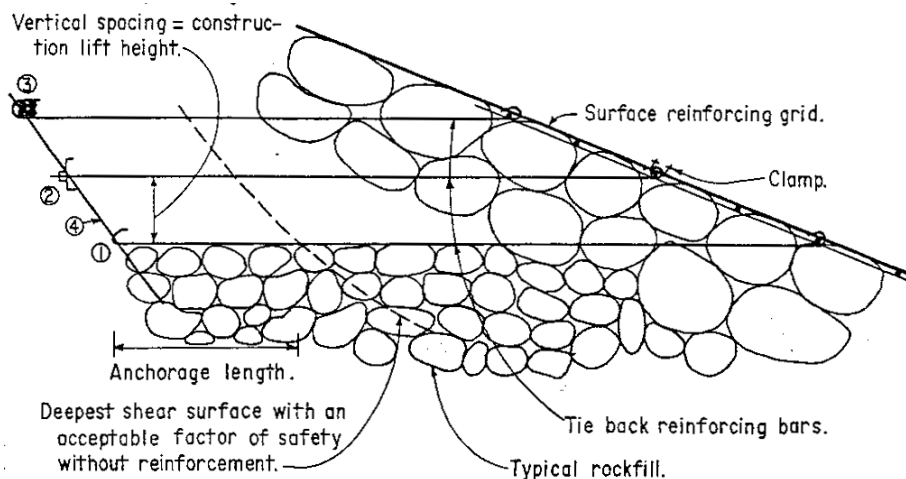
Schematic detail of steel reinforcing bars with tie-back anchor alternatives (Brown et al., 1983) [6].
